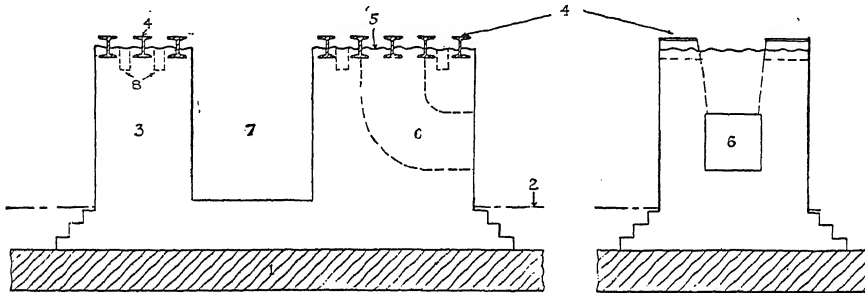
1, Concrete float. 2, Ground or basement level. 3, Foundation block. 4, Short steel girders built in. 5, Surface of block left rough for grouting. 6, Air inlet to generator. 7, Space for condenser. 8, Foundation bolt holes.
